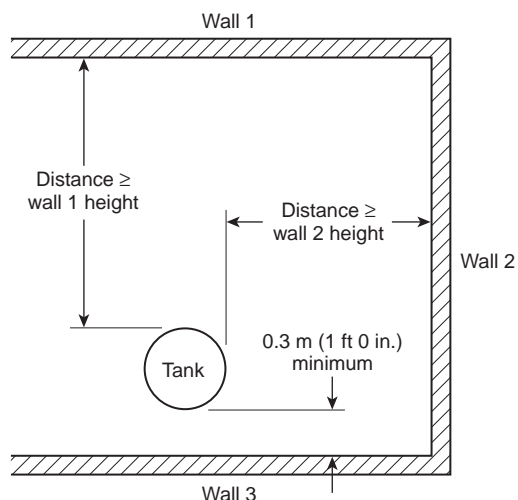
(D)(1) Bulk Cryogenic System Located in a Courtyard. [55:Figure A.8.13.2.7.2.1]
